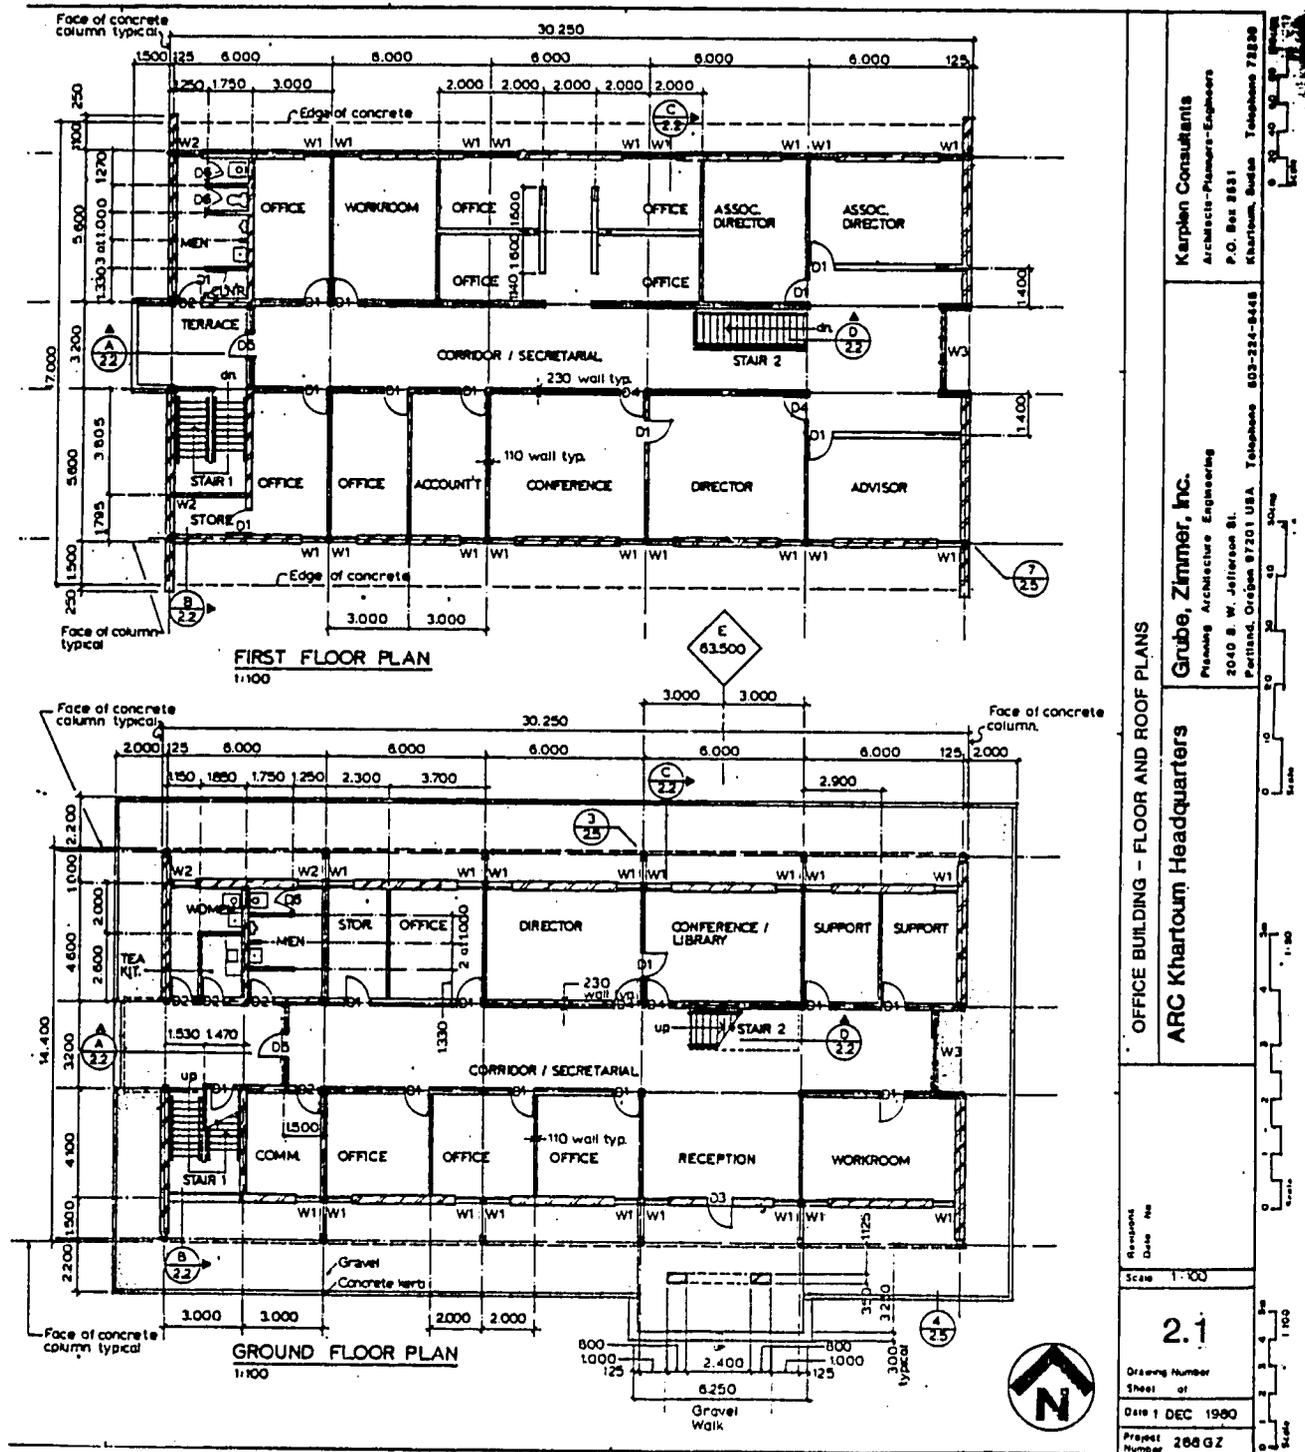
Project Support Unit/ARC Liaison Office: Floor Plan
